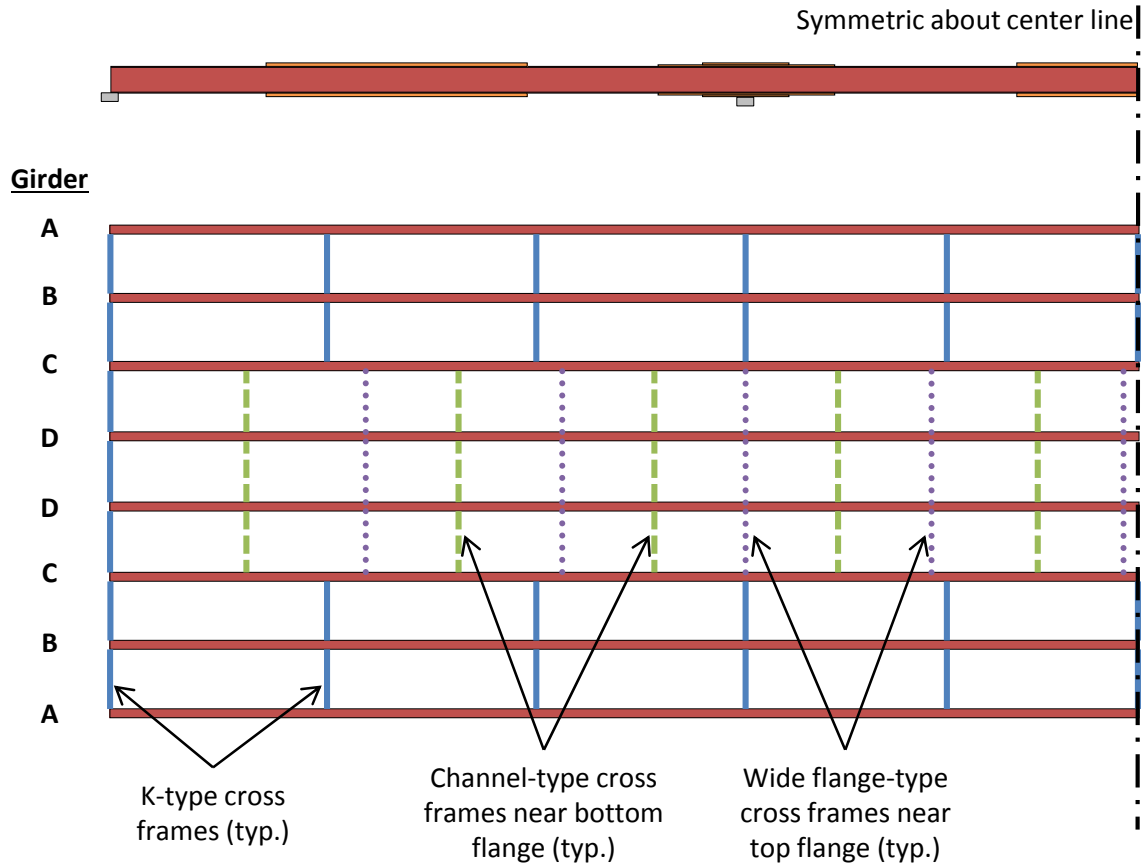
Plan View of Half of the Bridge Showing Locations of Different Types of Cross Frames
